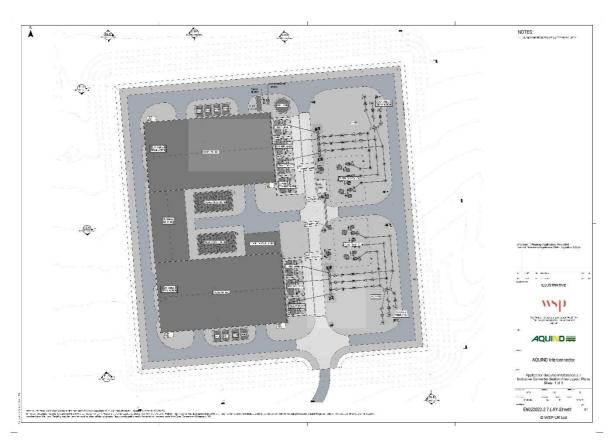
Indicative Converter Station plan [APP-013]: illustrating how buildings and equipment could be arranged within the compound to comply with the Parameter Plan
